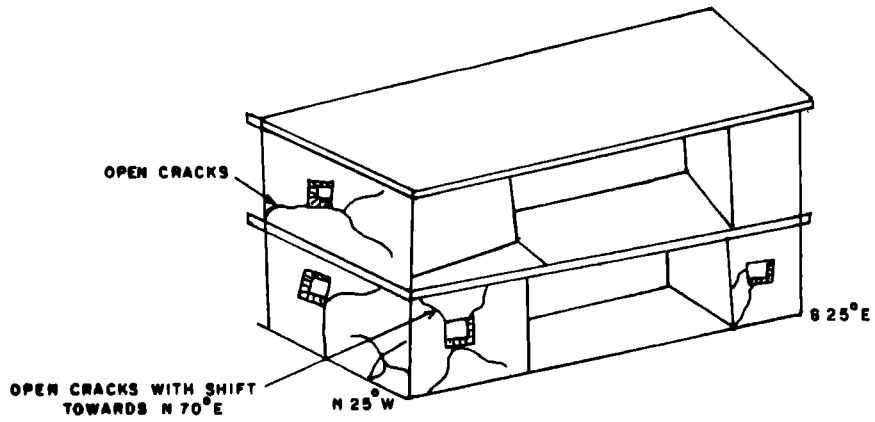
HOUSE OF SRI RAM CHANDRA VILLAGE NALD.
